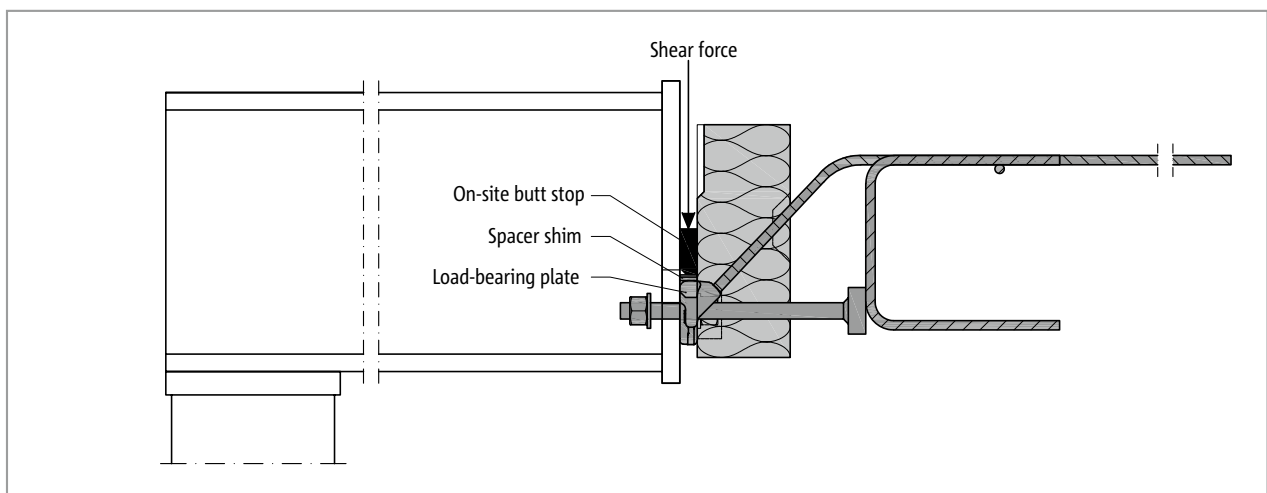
Schöck Isokorb® T type SQ: On-site butt stop for transferring shear forces
